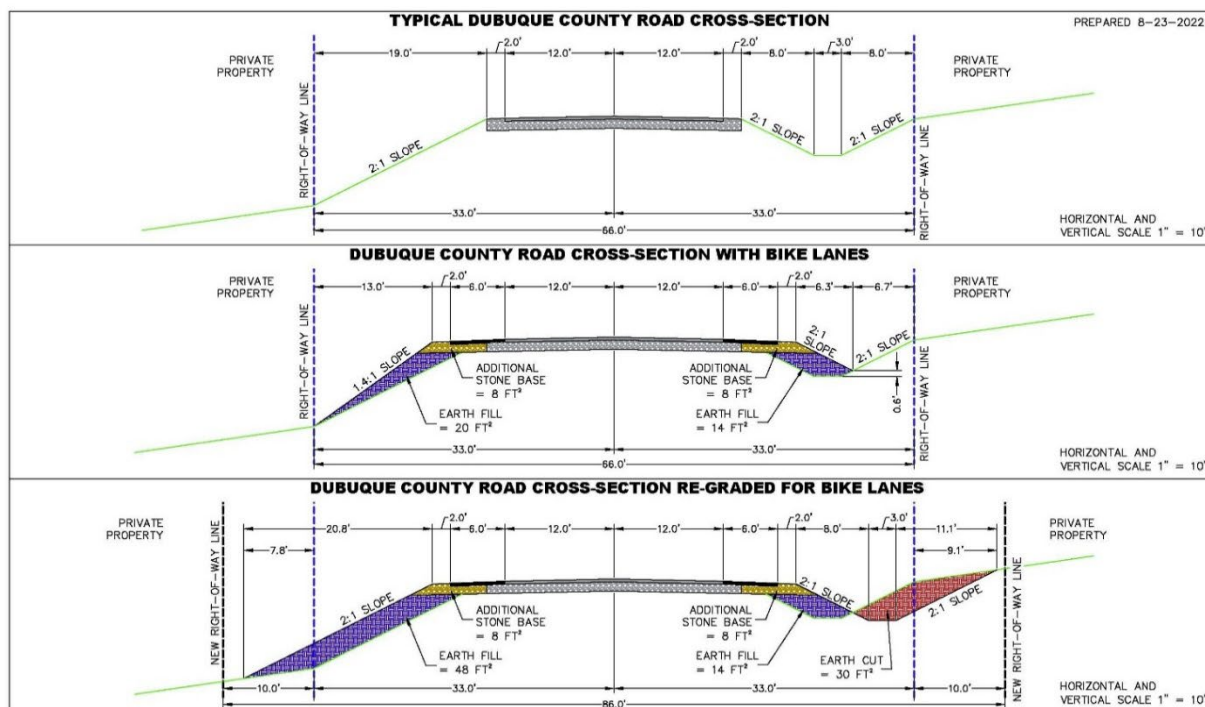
Typical County Road Cross-Sections: Bike Lanes (or Paved Shoulders)
